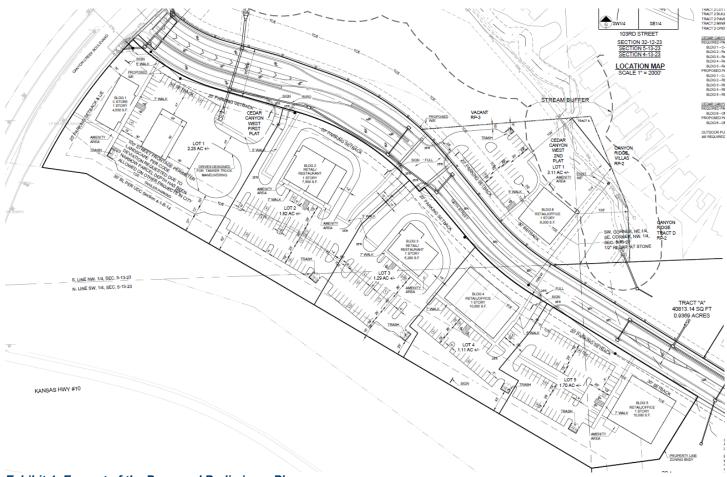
Excerpt of the Proposed Preliminary Plan.
